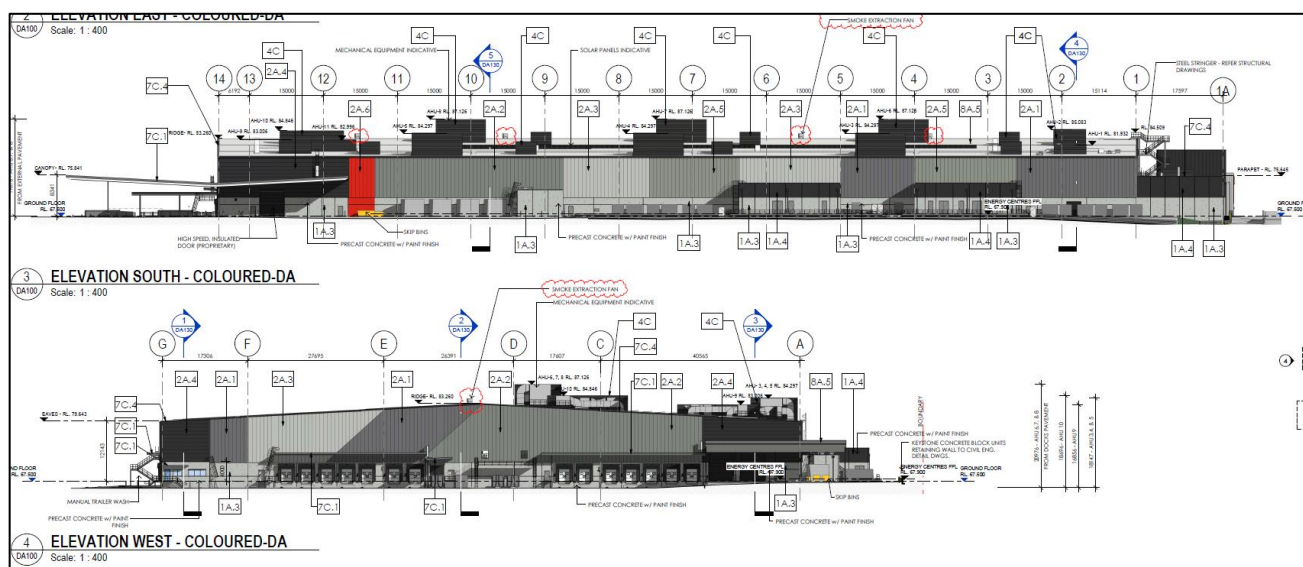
Proposed Elevations (South and West) – SSD-10404-Mod-1
